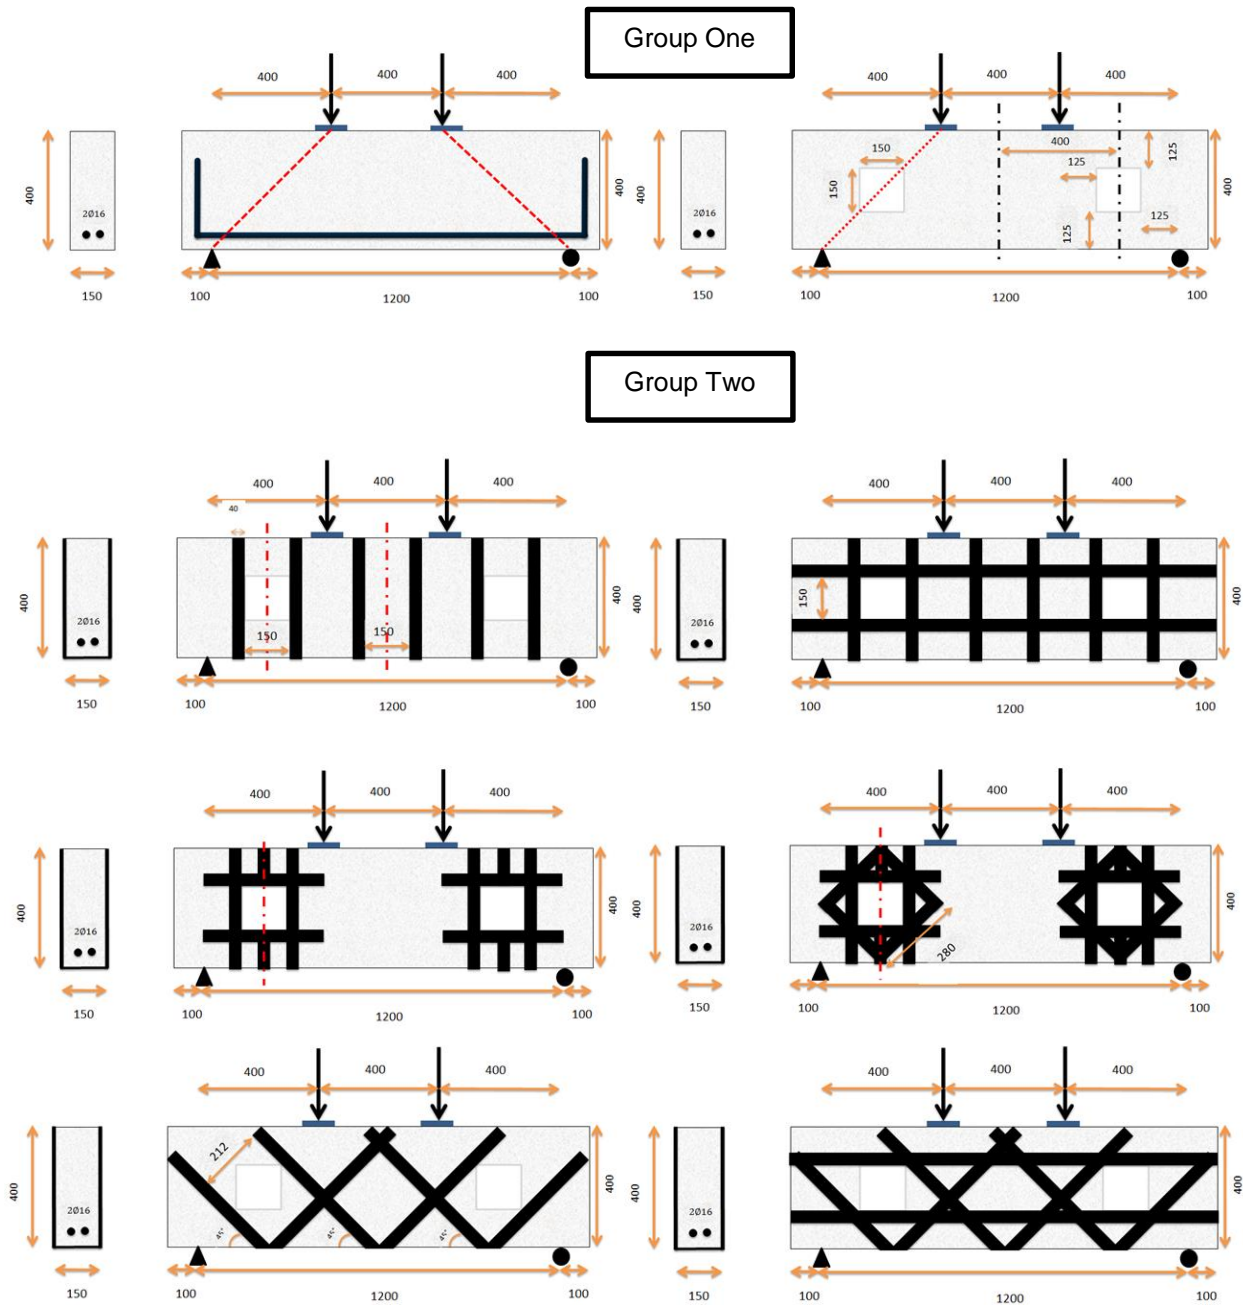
Detail and Geometry of Beams (All Dimensions in mm)
